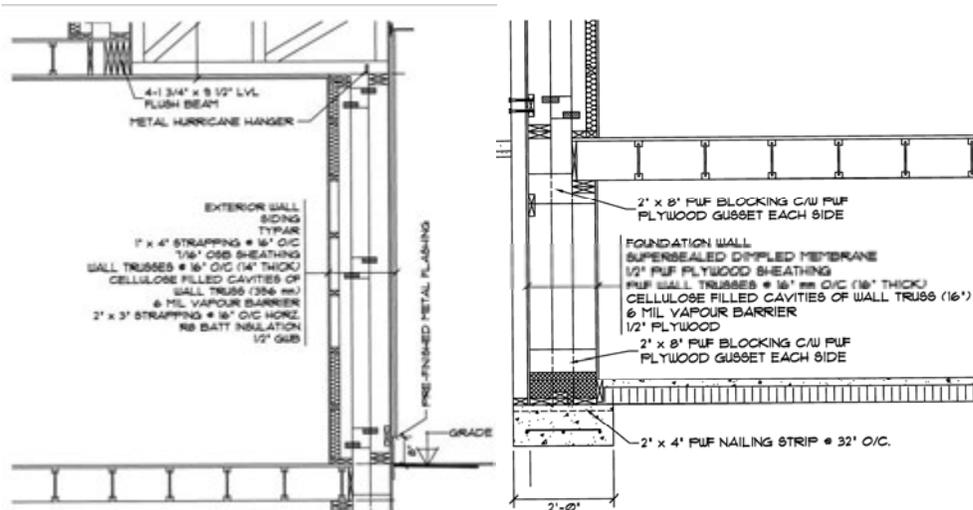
Building 1 above grade wall (left) and below grade wall (right) details (N.T.S.)
